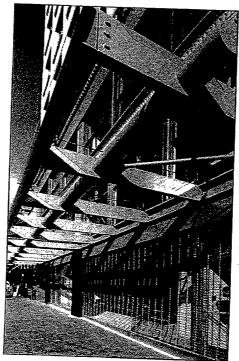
Judson Rives Building, 424 S. Broadway, Los Angeles, detail view of contemporary canopy added to historic building facade
